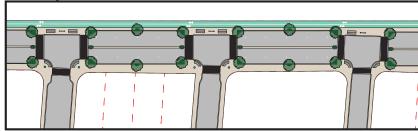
Town Center- Extending along Shell Beach Road from Placentia Ave to Santa Fe Ave.
